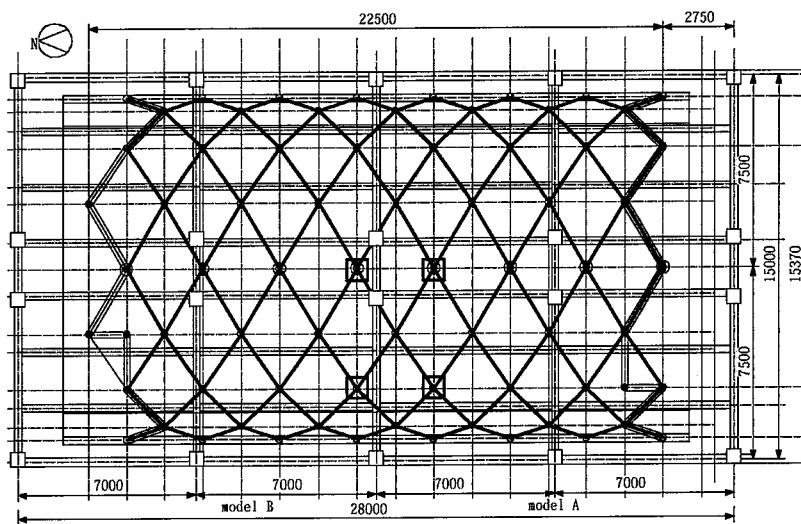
Plan of a tension truss dome (□: wire rope hanging position)
